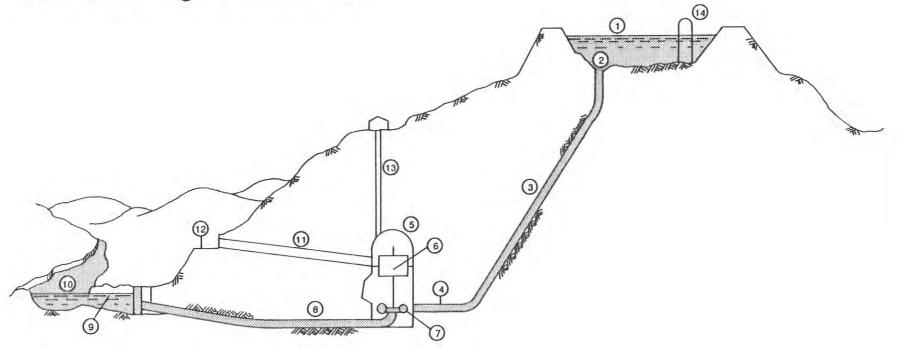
CROSS SECTION NORTHFIELD MOUNTAIN PUMPED STORAGE PROJECT
